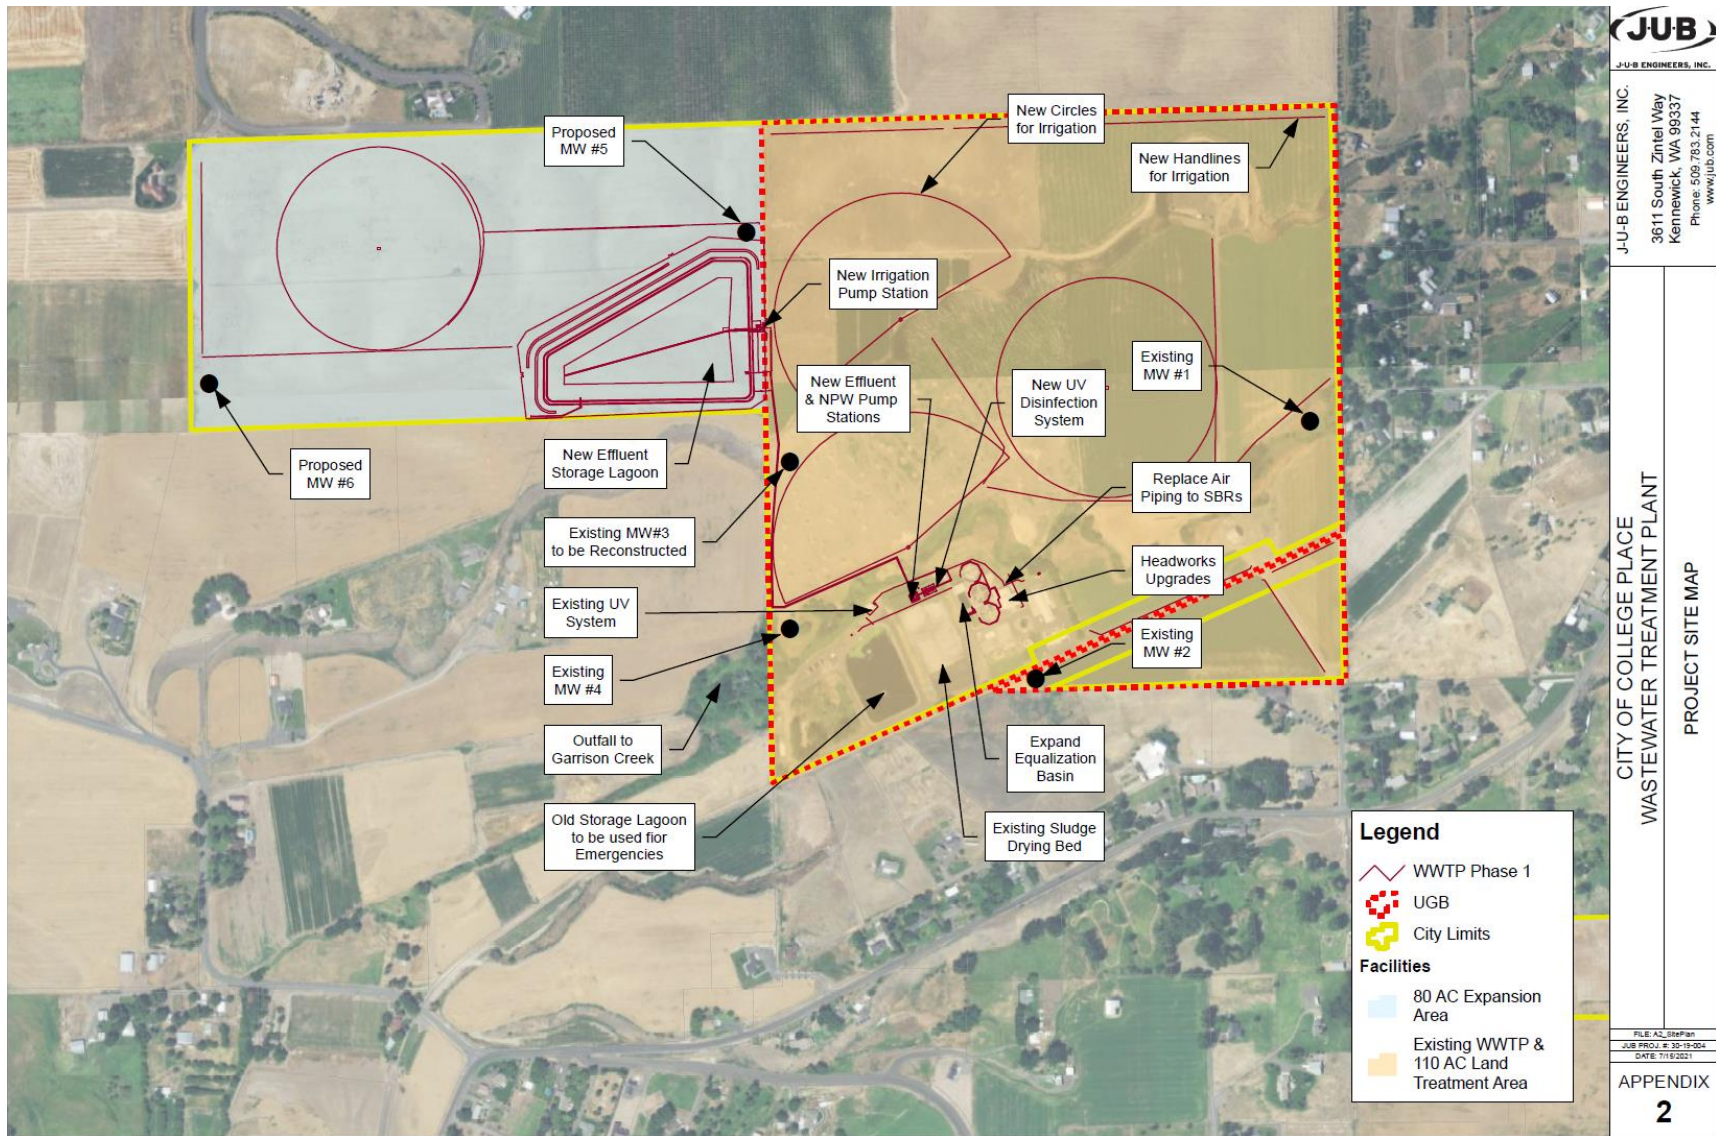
City of College Place Wastewater Treatment Plant Upgrade project components and location of existing and proposed groundwater monitoring wells.
